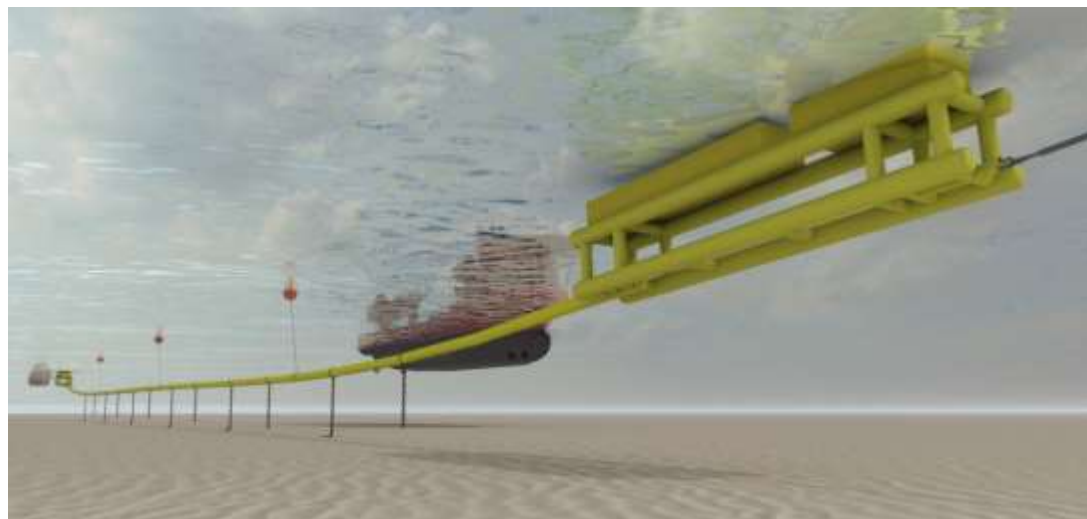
Bundle Tow Arrangement – Off Bottom Tow
